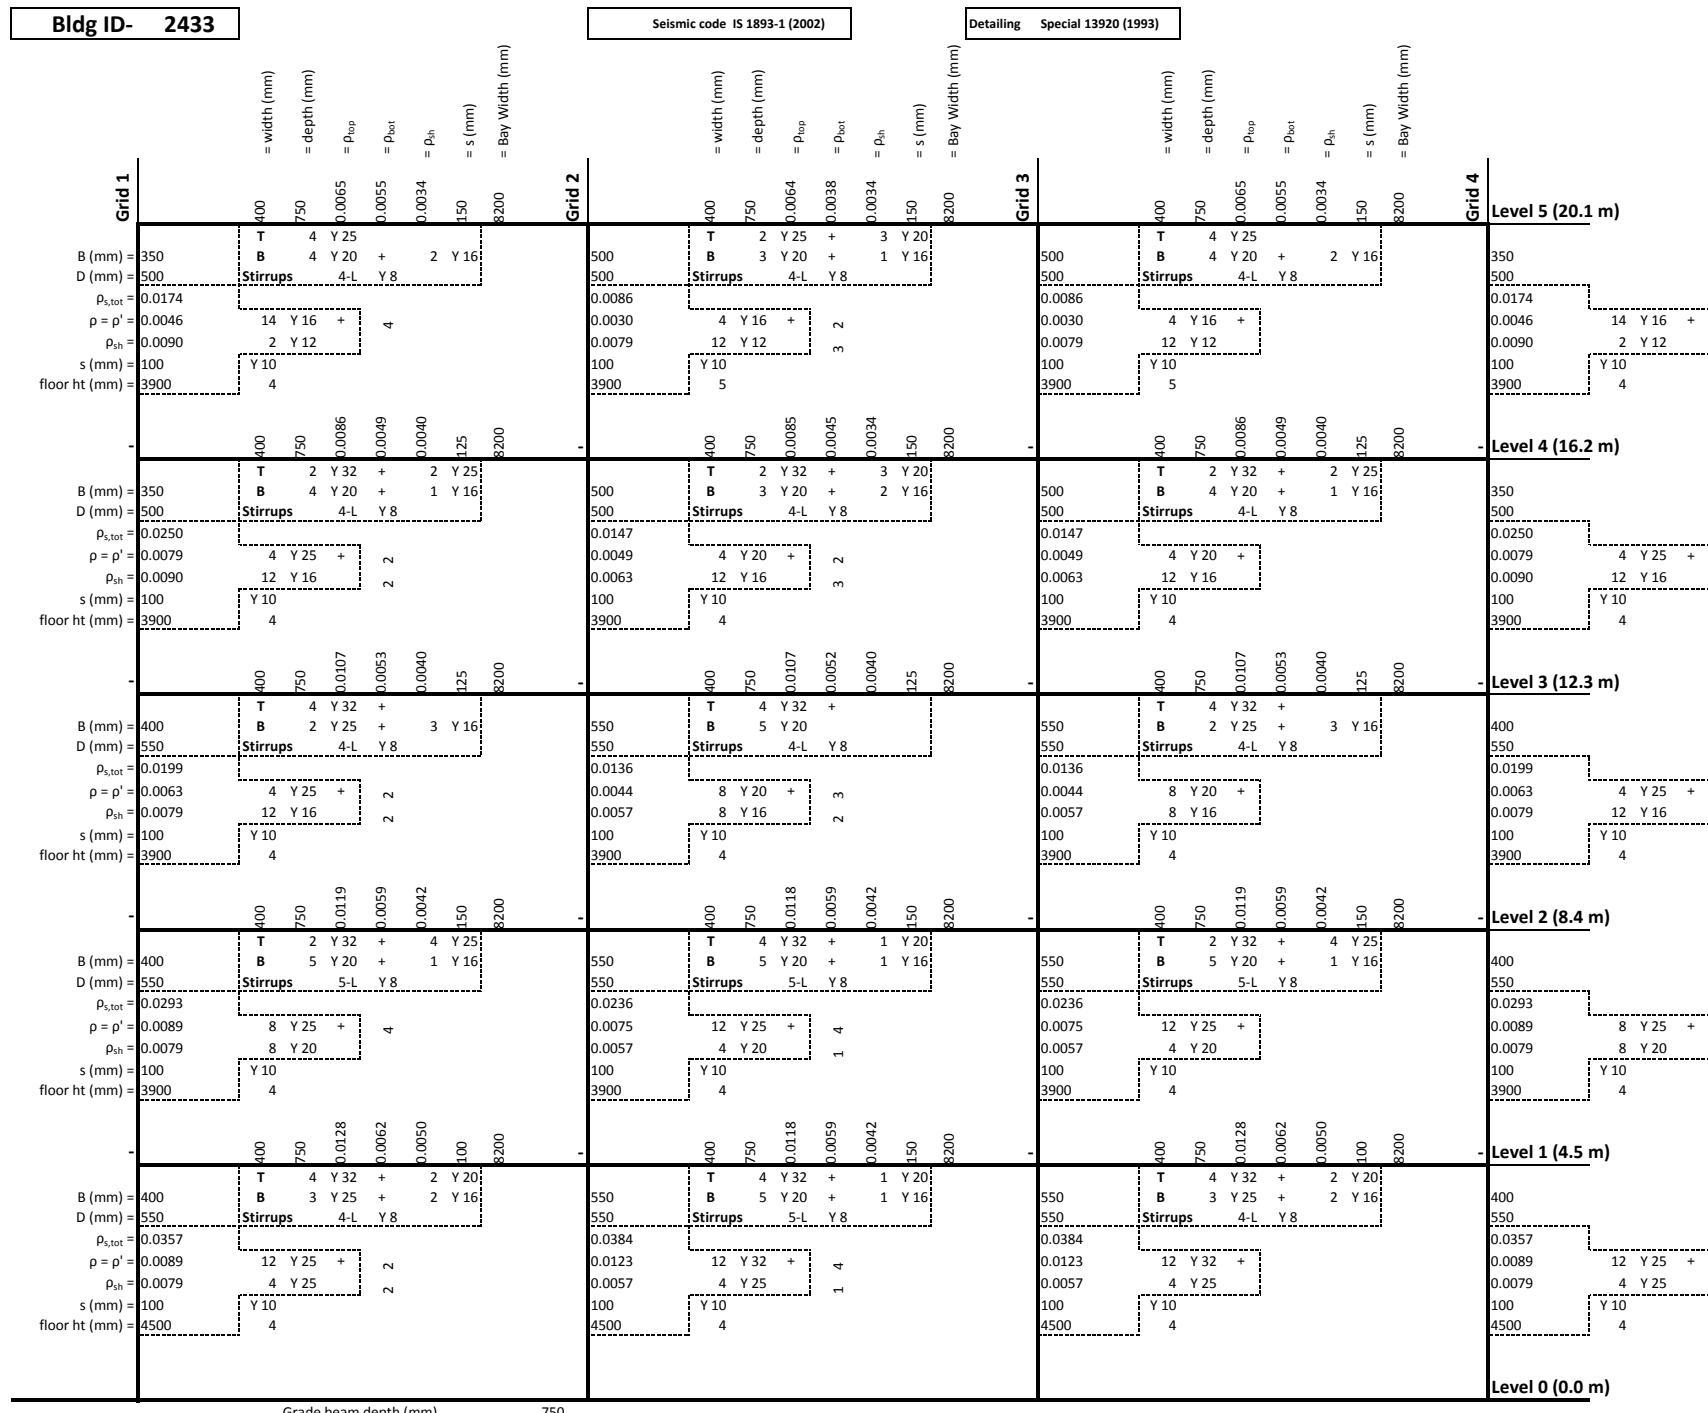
Provided reinforcement and modeling details for building ID 2433
